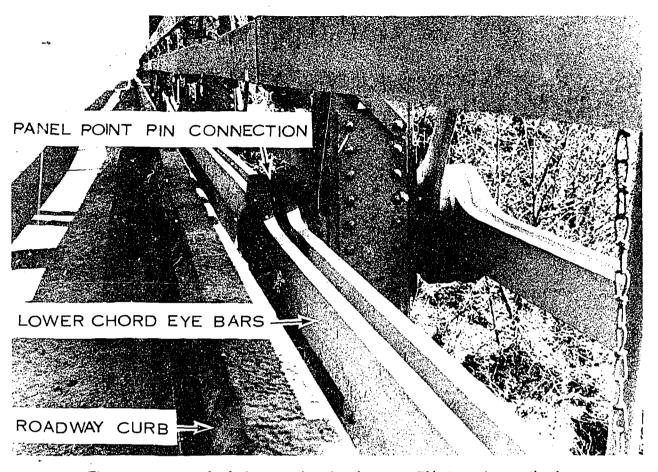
Lower chord pin connection of eyebar truss. This type of connection is particularly susceptible to the effects of moisture and brine splashed from the roadway.
